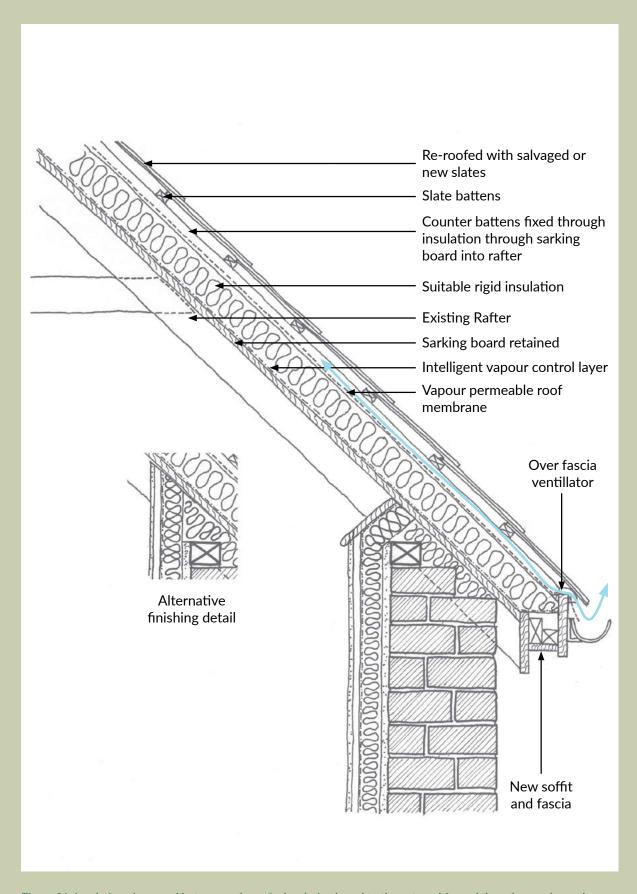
Insulation above and between rafters. An insulating board to the external face of the rafters reduces the chance of thermal bridging but will raise the roof level and may not be acceptable in certain cases
